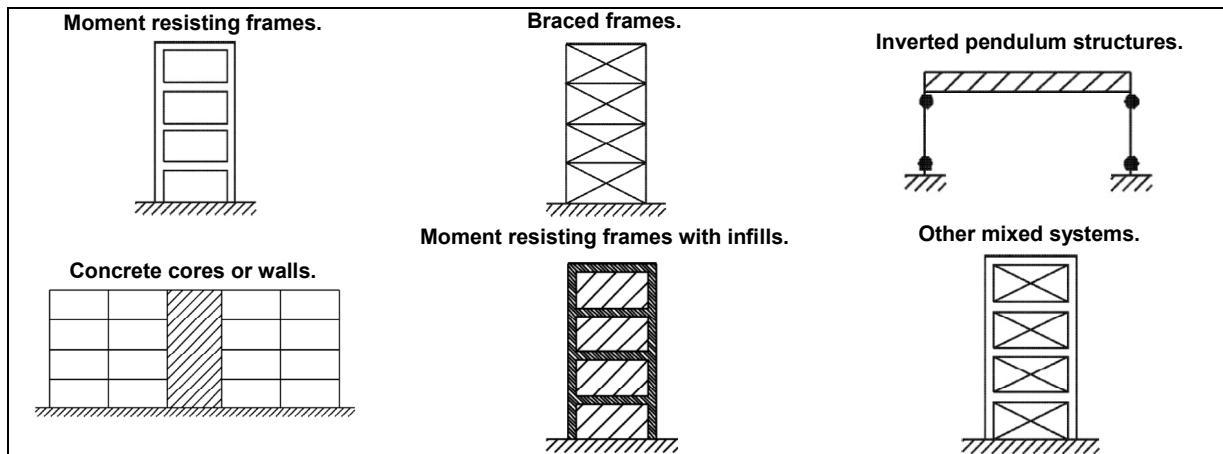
DIFFERENT LATERAL LOAD RESISTING STRUCTURAL SYSTEMS [1]
